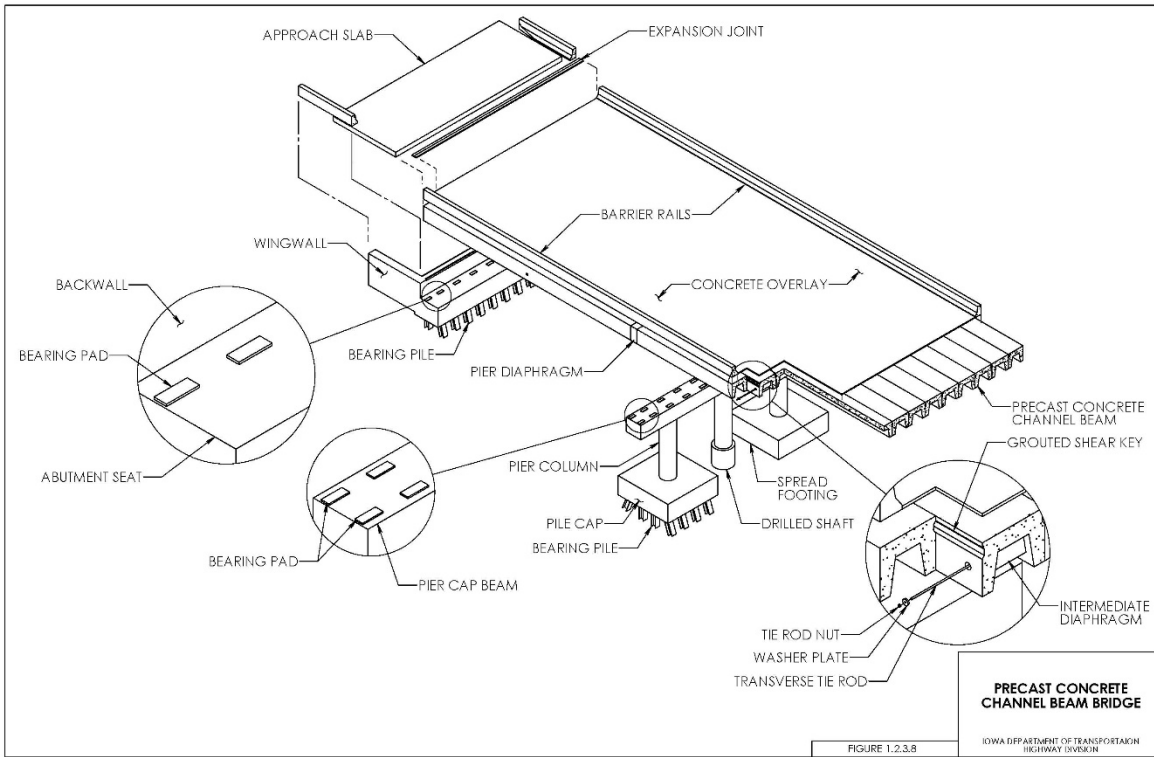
Precast Concrete Channel Beam Bridge Components
